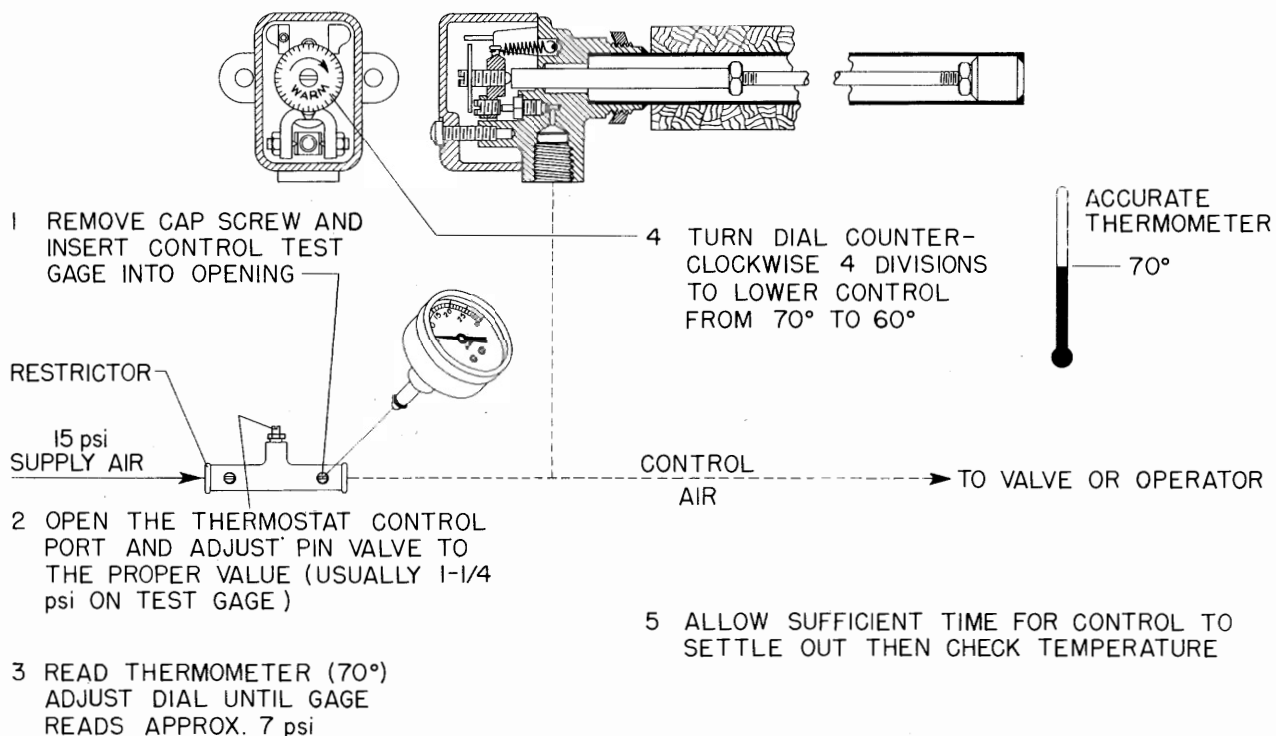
ADJUSTING NON-RELAY THERMOSTAT
